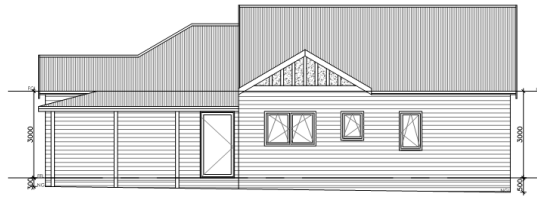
West elevation, showing main entrance, south elevation to the right of picture
